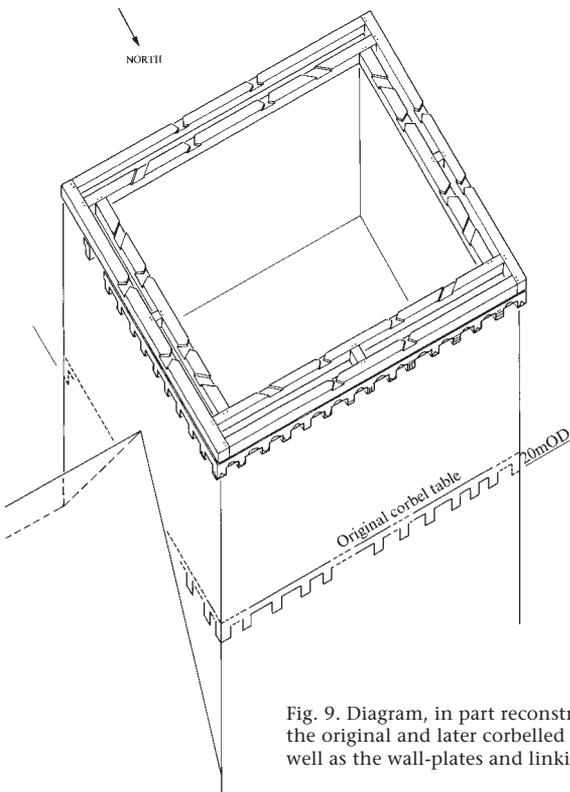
Diagram, in part reconstruction, showing the original and later corbelled eaves-courses as well as the wall-plates and linking pieces.
